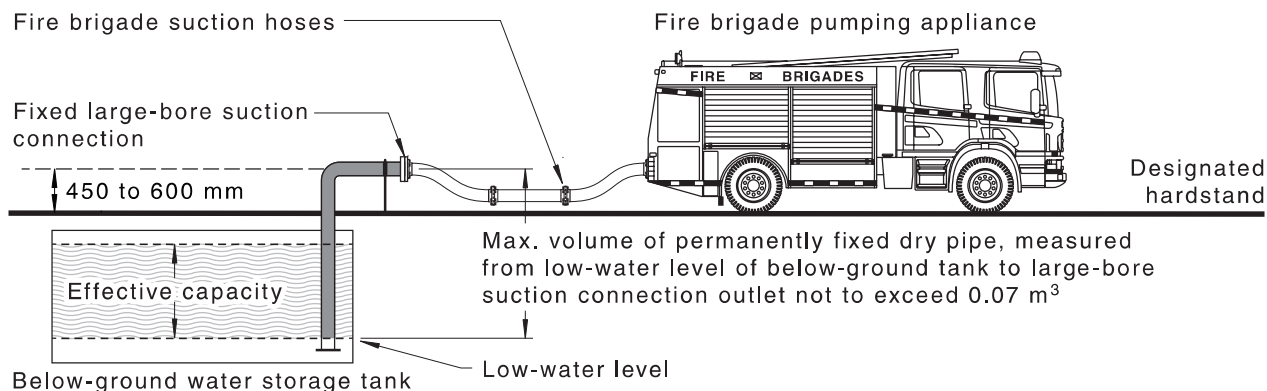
(C) — Maximum volume of fixed on-site dry pipe from a below-ground water storage
